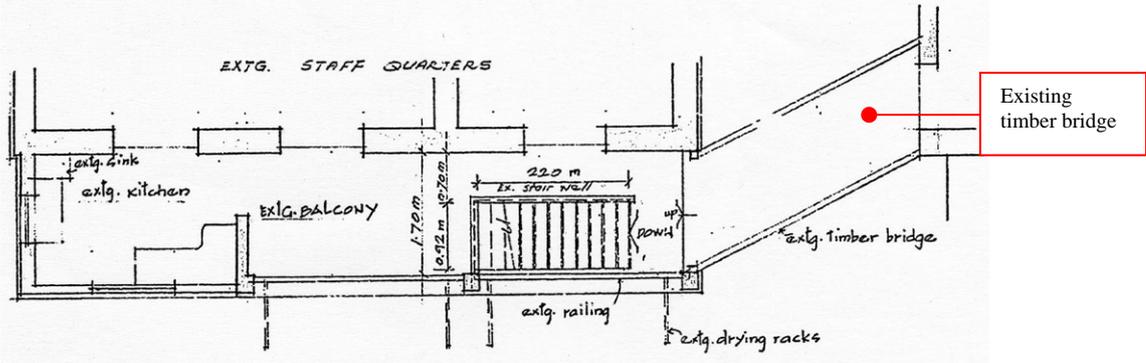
Extracted first floor plan of the proposed concrete staircase to existing staff quarters in 1975.
